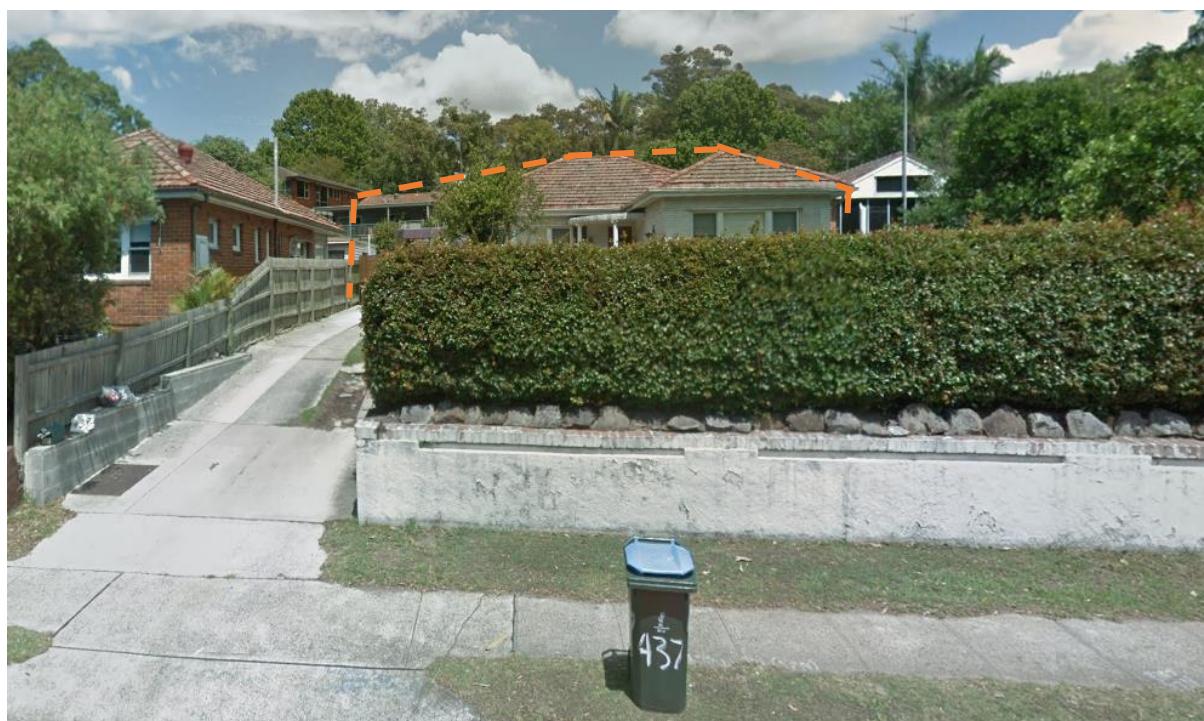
Subject site as viewed from Condamine street (Google Maps, June 2019)
